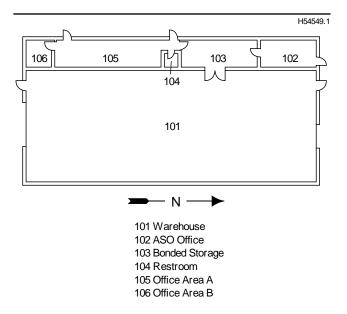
Building 4 Detailed Floor Plan, Astrotech
